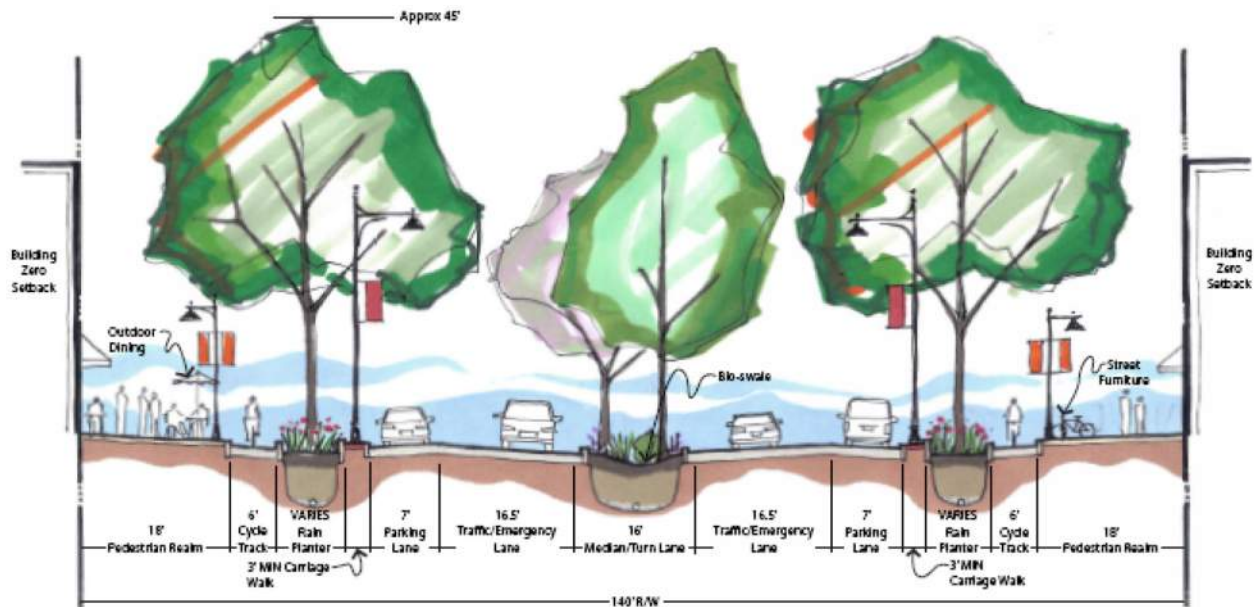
Woodson Terrace Comprehensive Plan Woodson Rd. Concept 2
